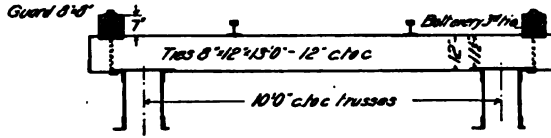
STANDARD DECK TRUSS - C. & O. RY.
